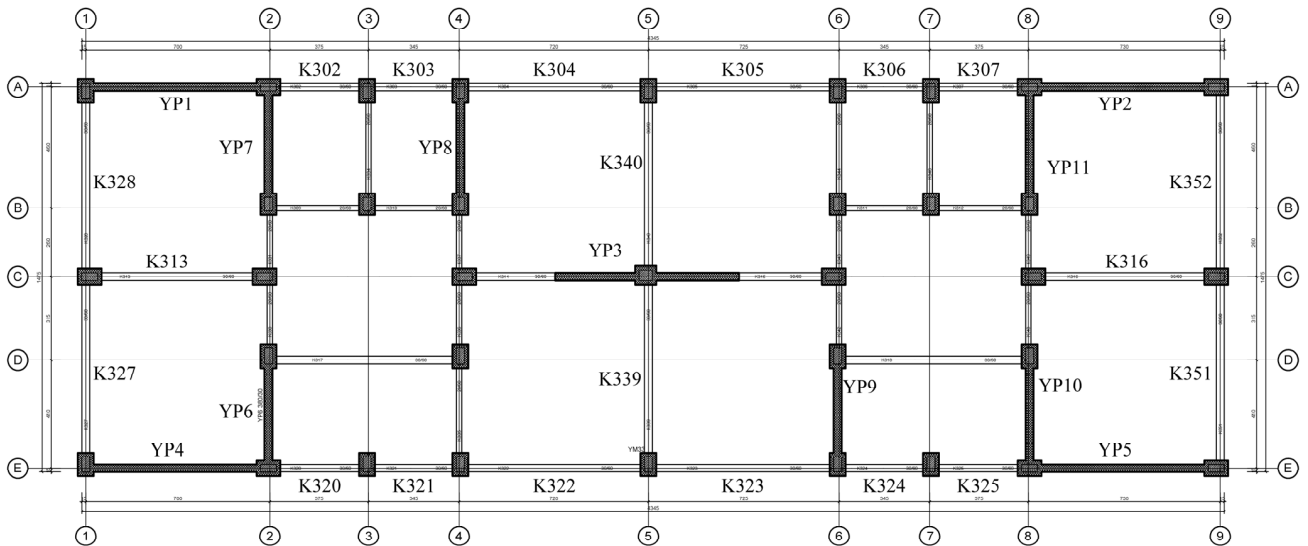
The structural layout of the +9.60 level slab, featuring jacketed columns and added shear walls for strengthening between frame columns.
